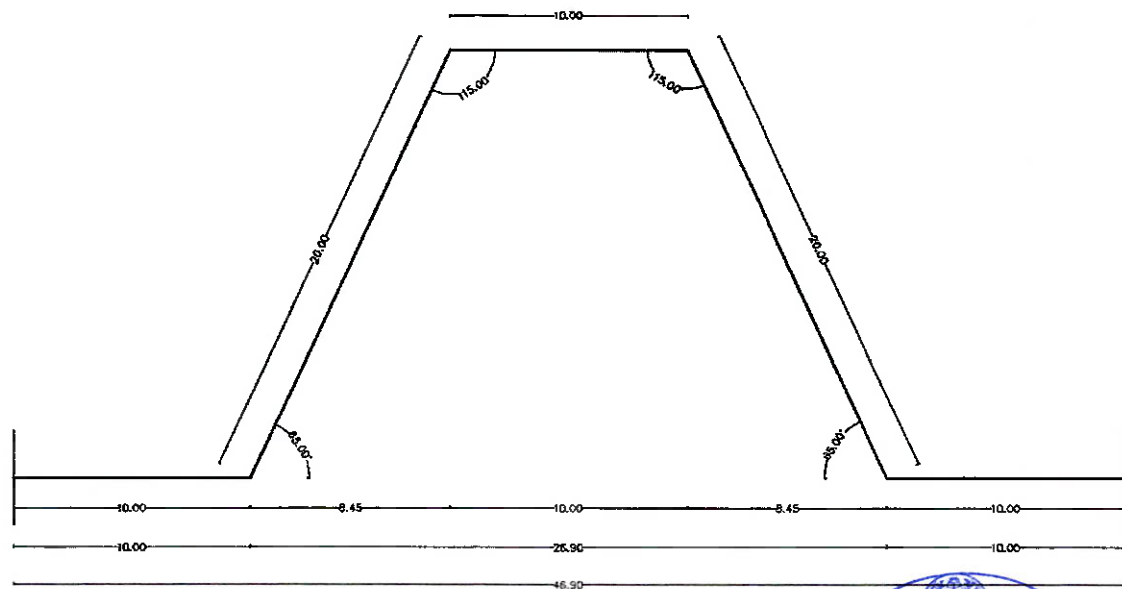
Plan form of Trapezoidal Duckbill Spillway
